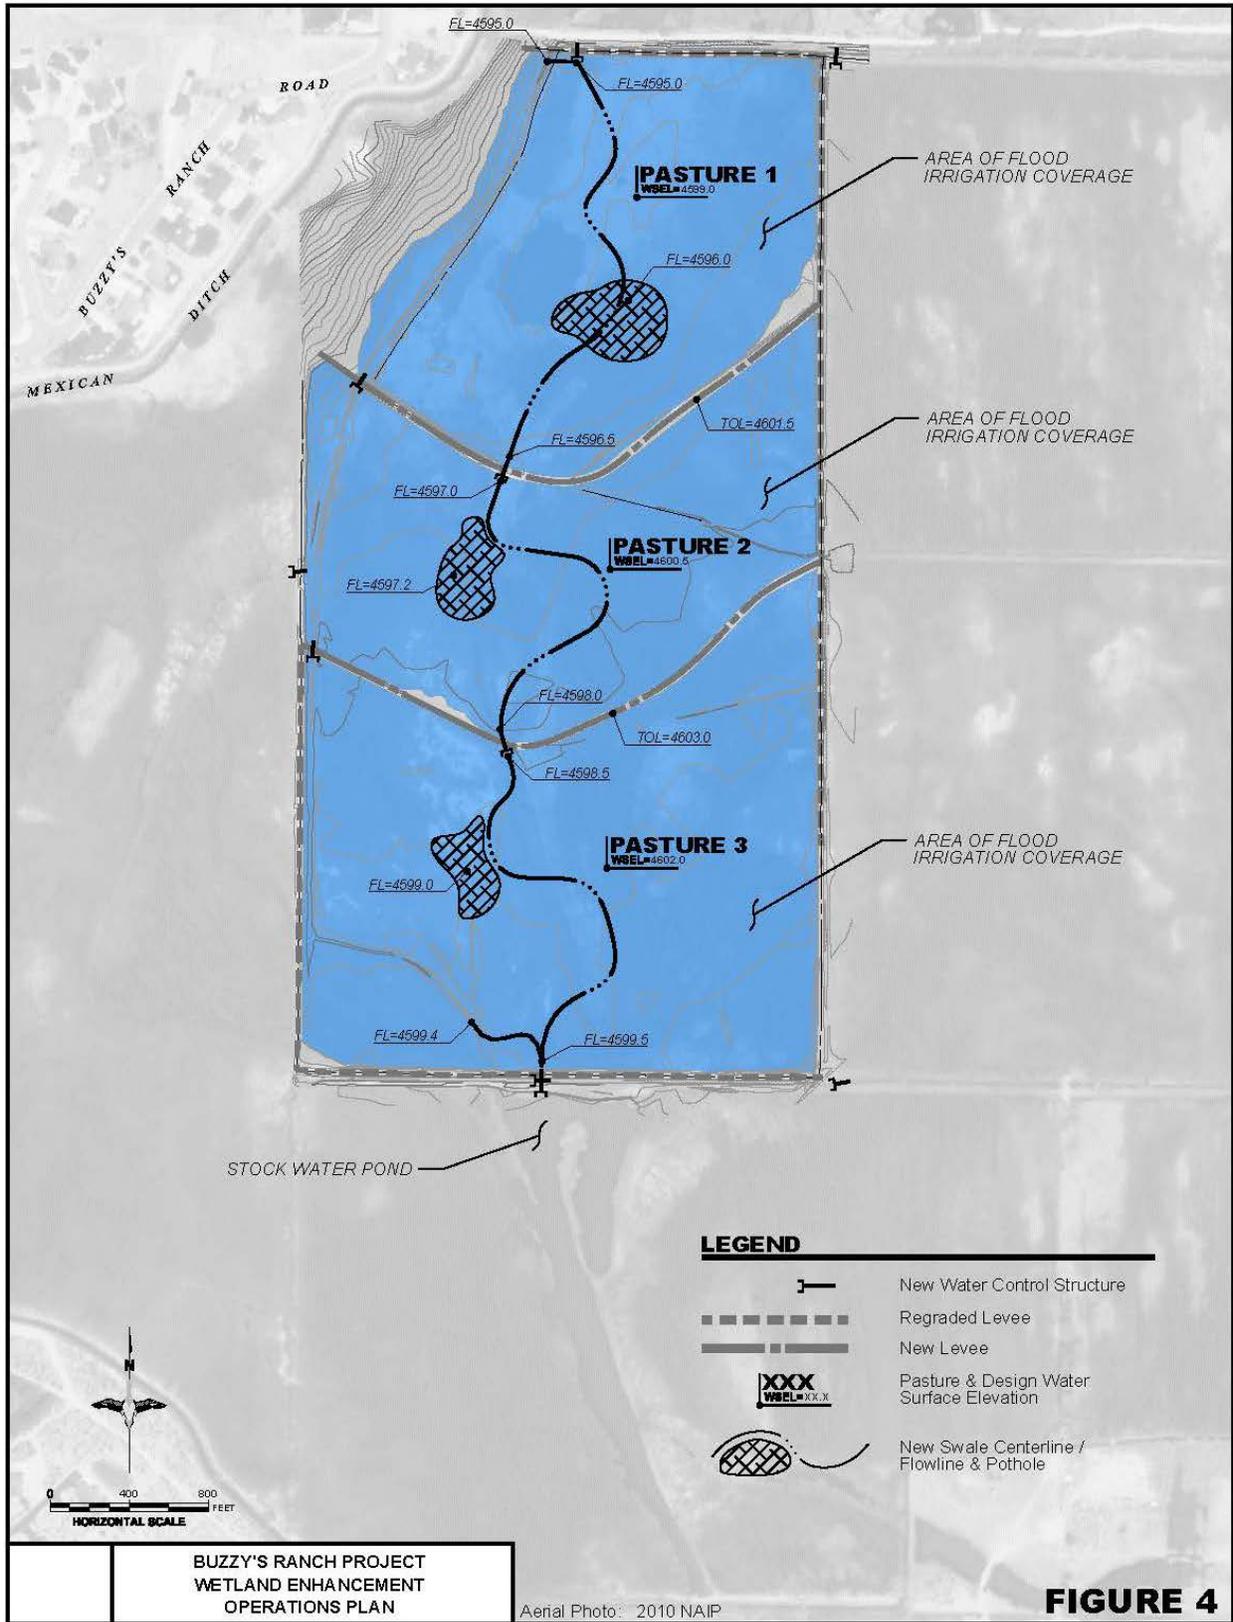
Flood irrigation extents when flashboards are installed to design water surface elevation.
